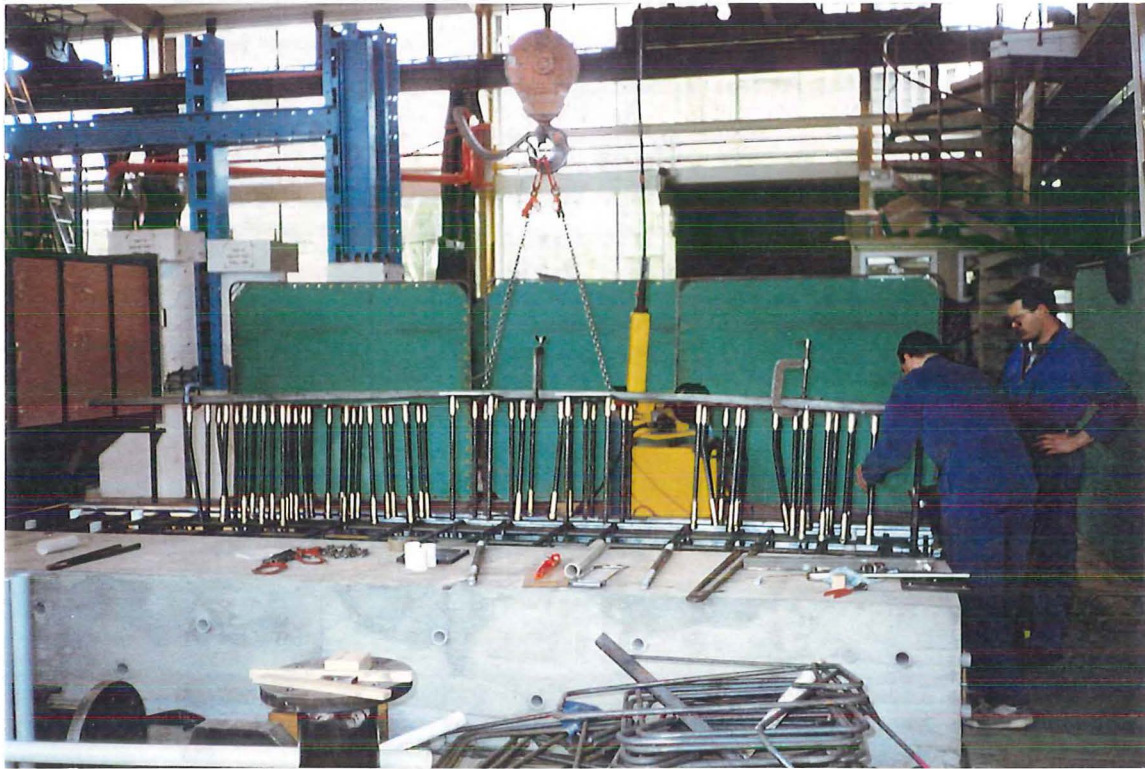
Baseblock Hold-down Connection Point Layout
